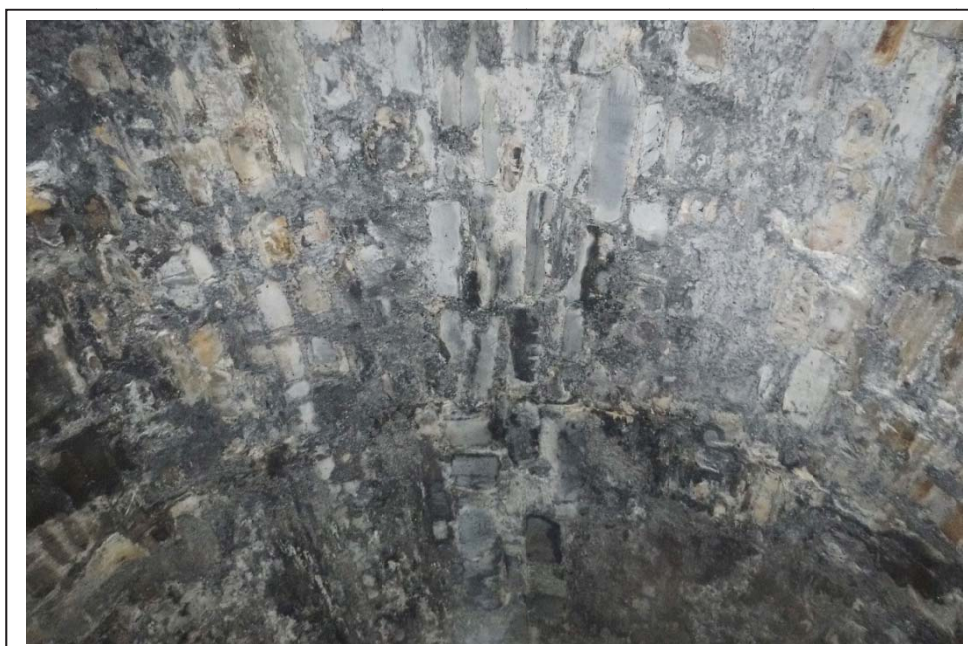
Spalling 450 x 300 x 125mm at DS haunch at 1.25ch
